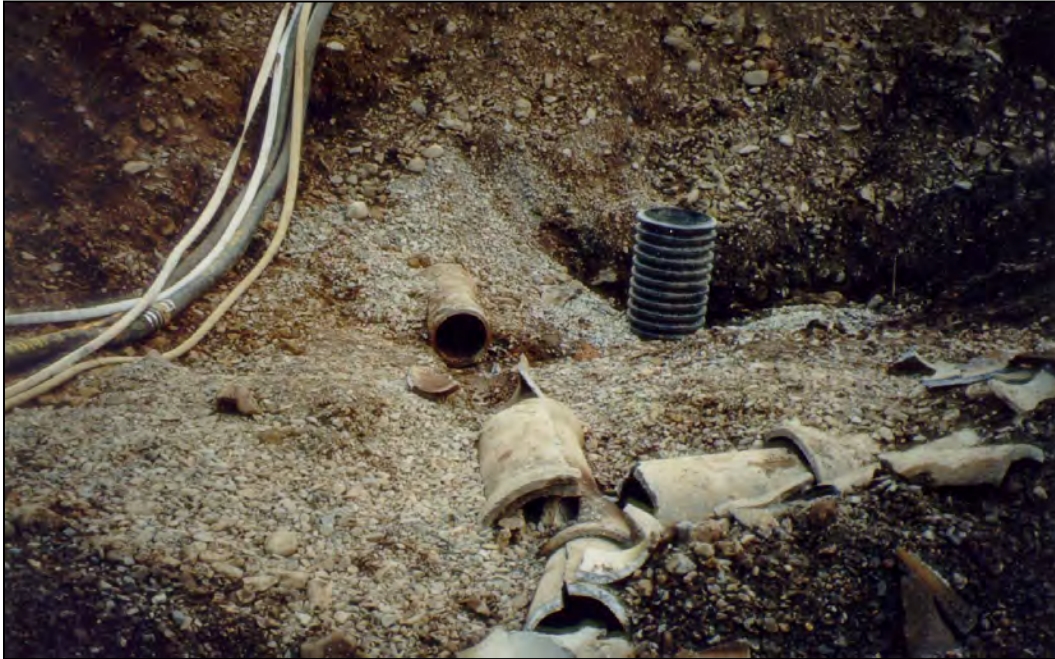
1950s era concrete pipe used as a toe drain. Water enters the pipe through a gap left in the bell and spigot joints. A “Y” junction is shown with two laterals that connect to a trunk line shown on the right side of the photo. Since connectors were not manufactured for this configuration, intact pieces of pipe were broken and the pieces used to stack together, making a protective cap for the junction. This junction was exposed during excavation for a toe drain replacement.
